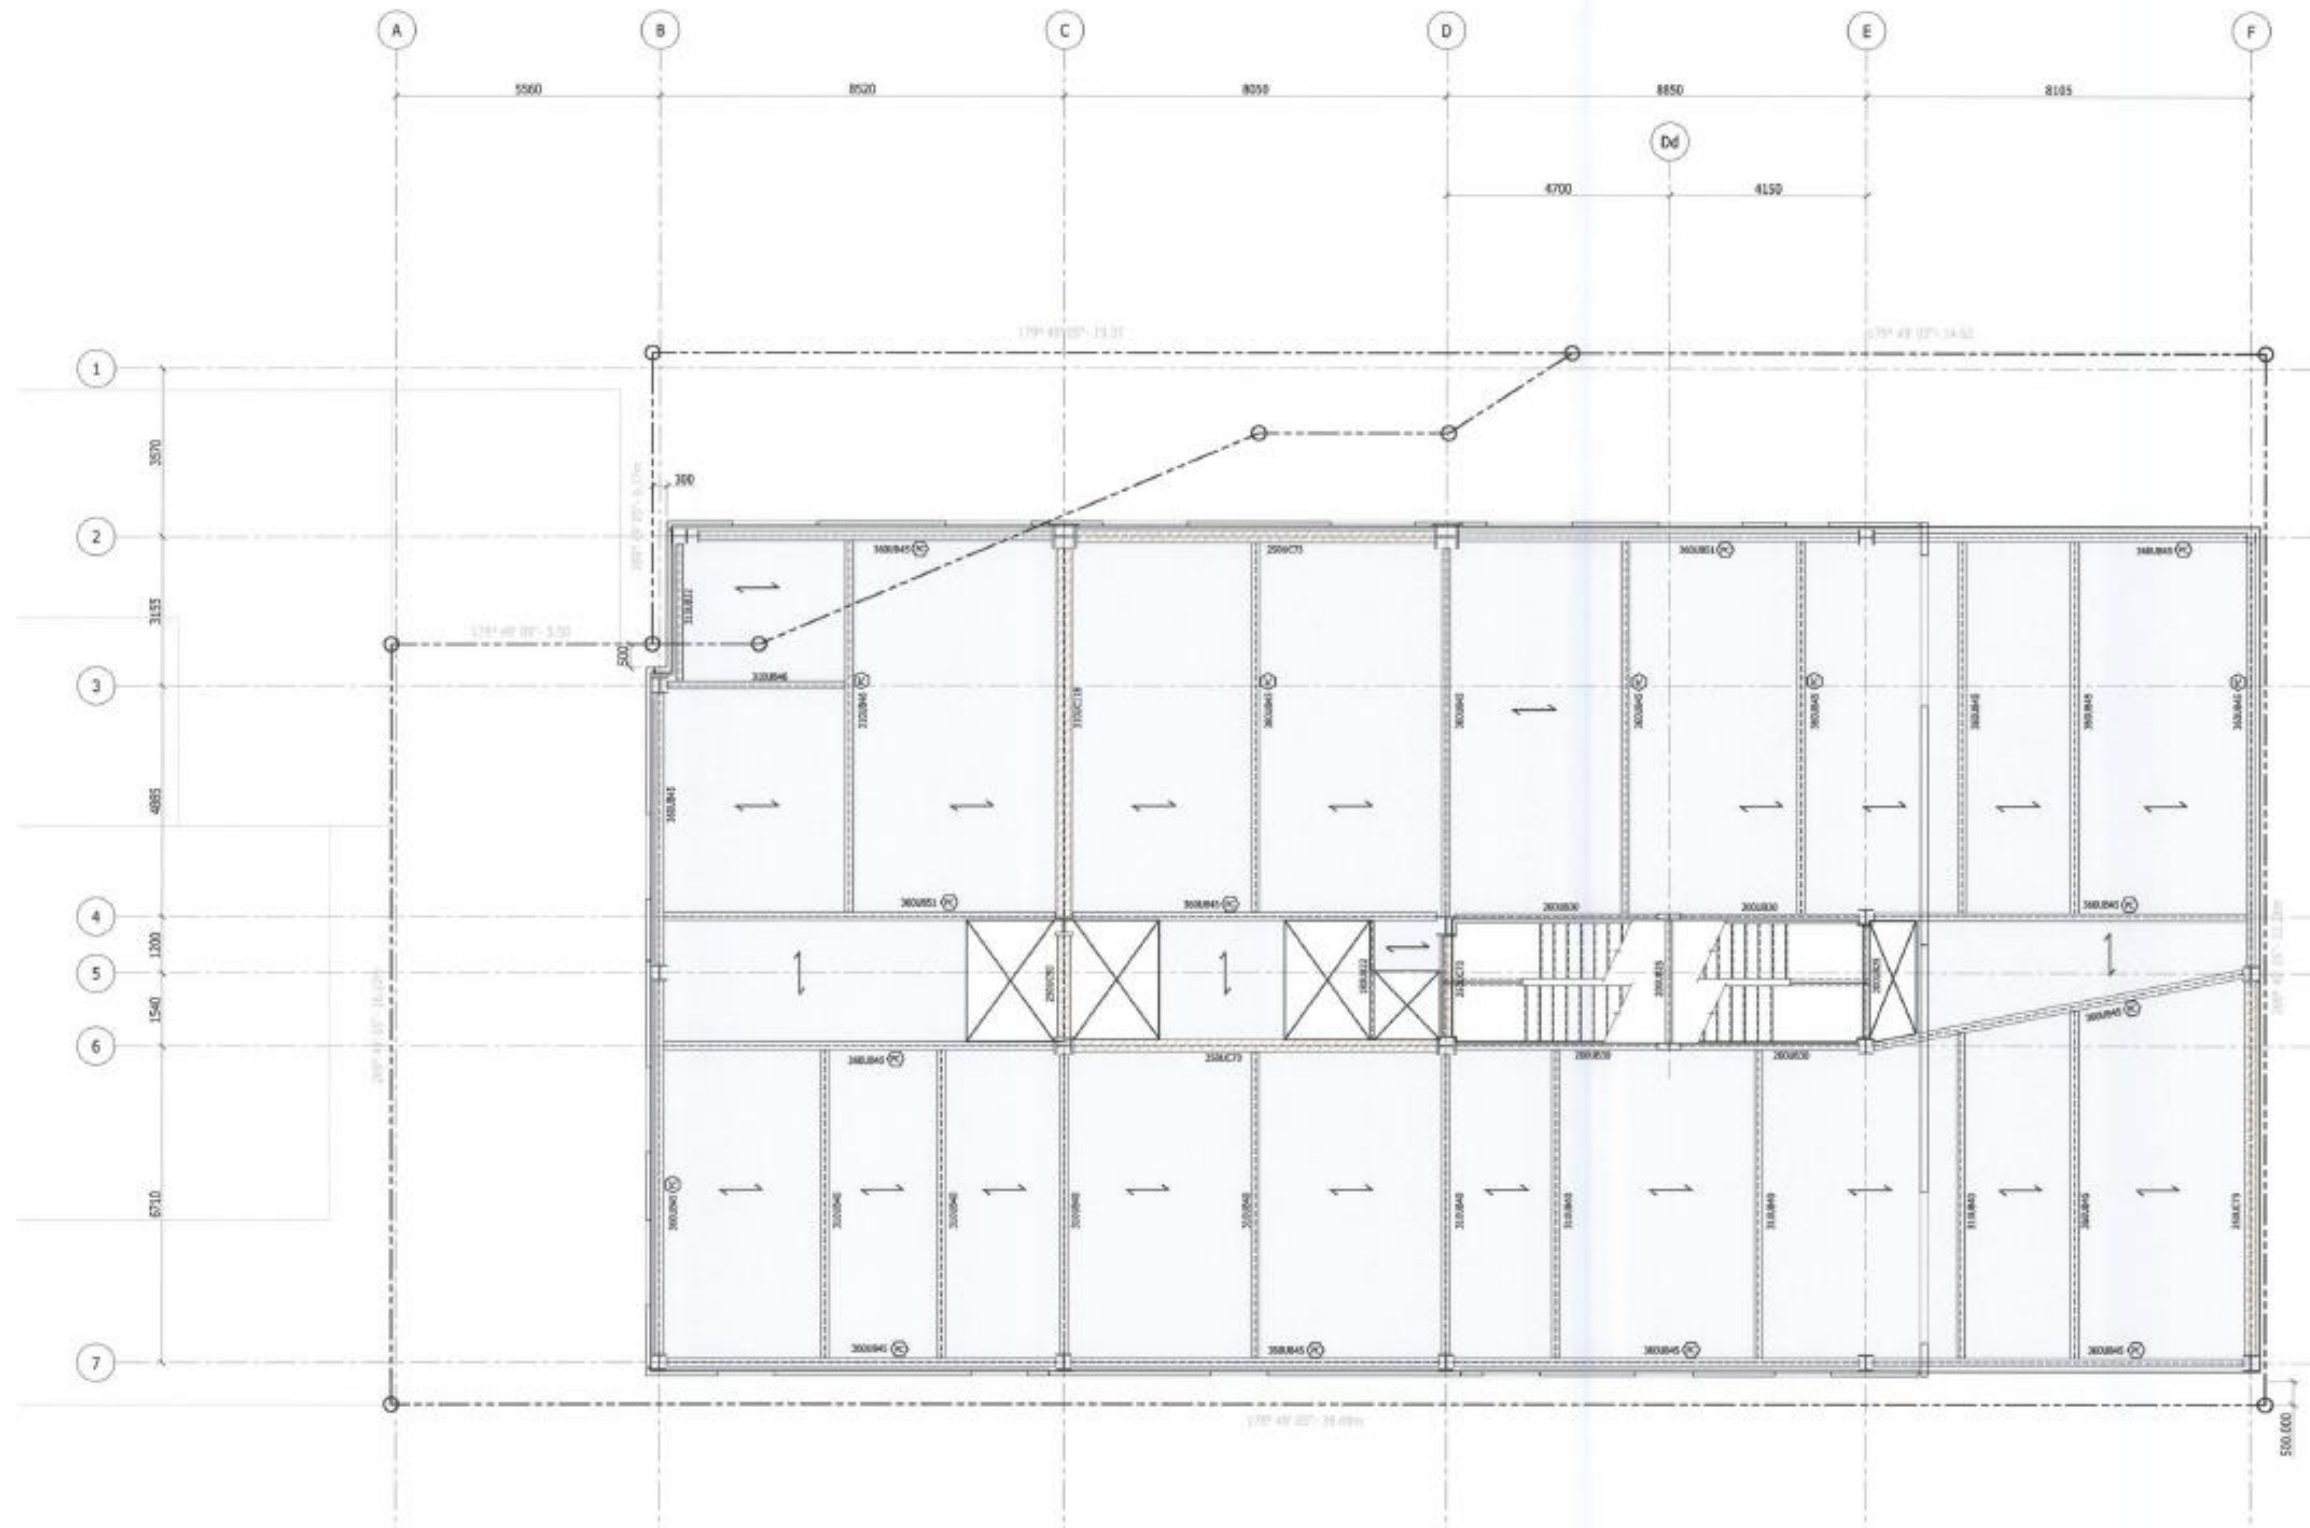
Structural Plan Level 11 (Christchurch City Council 2016c)
